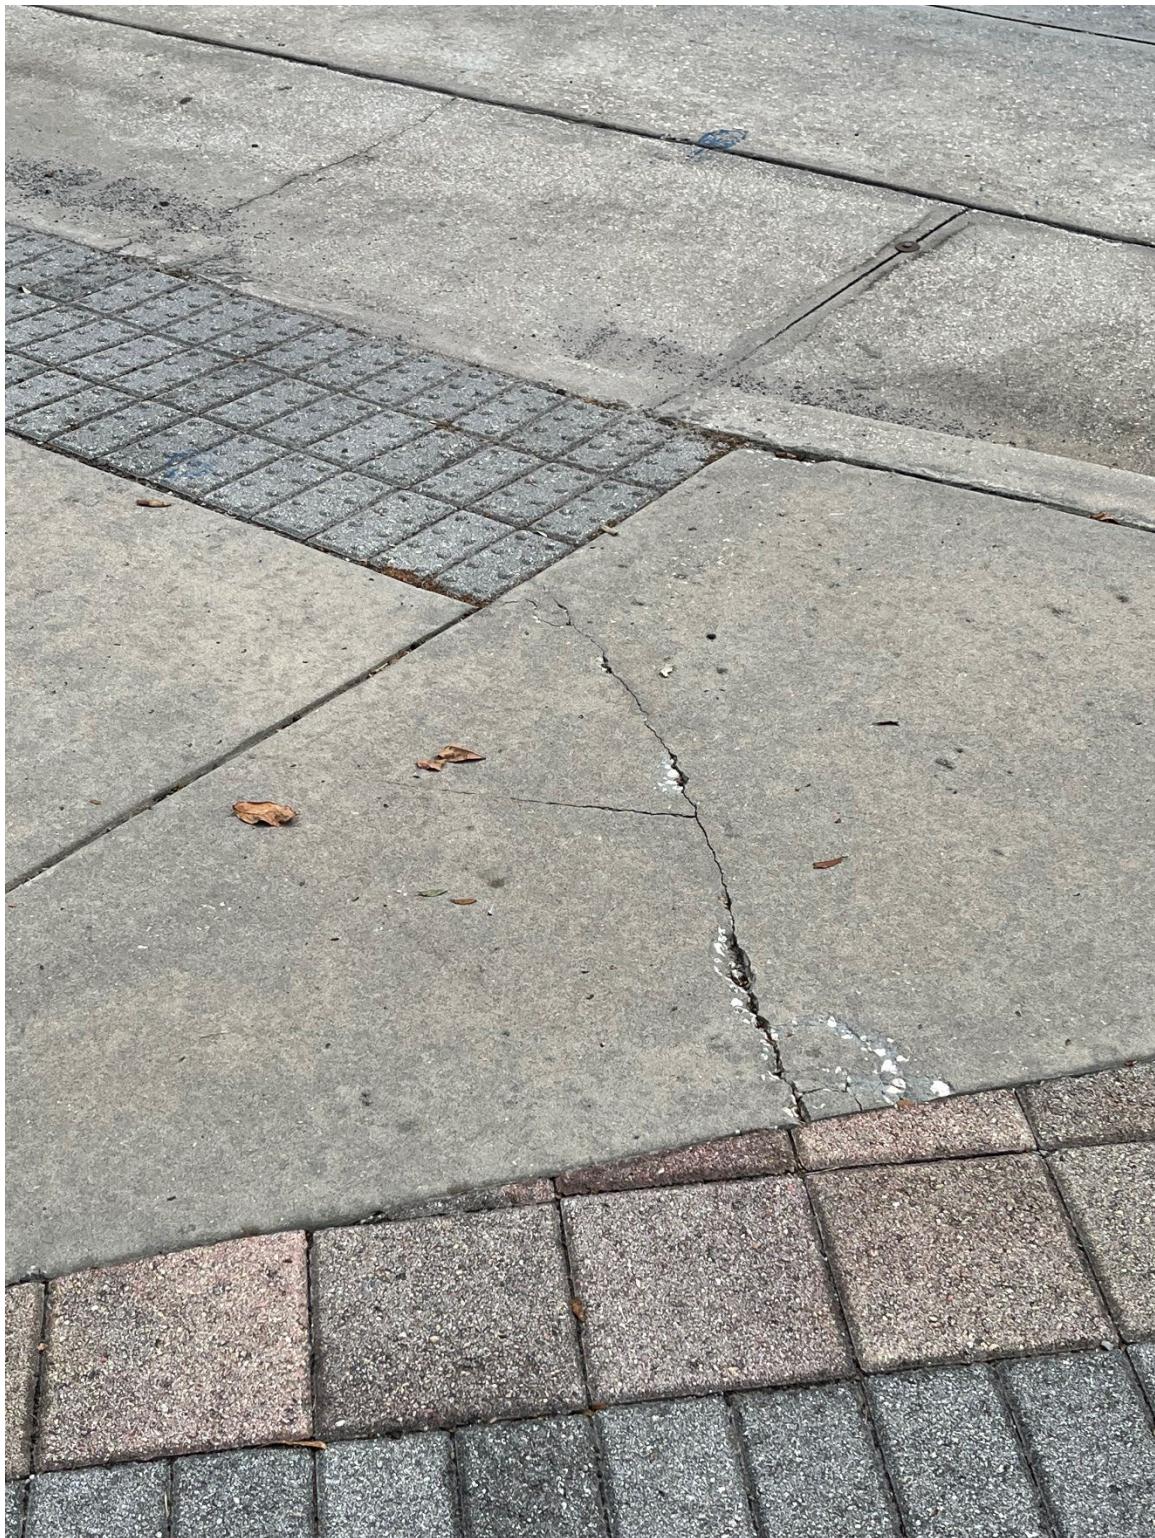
Surficial Concrete Cracks in Handicap Ramp
